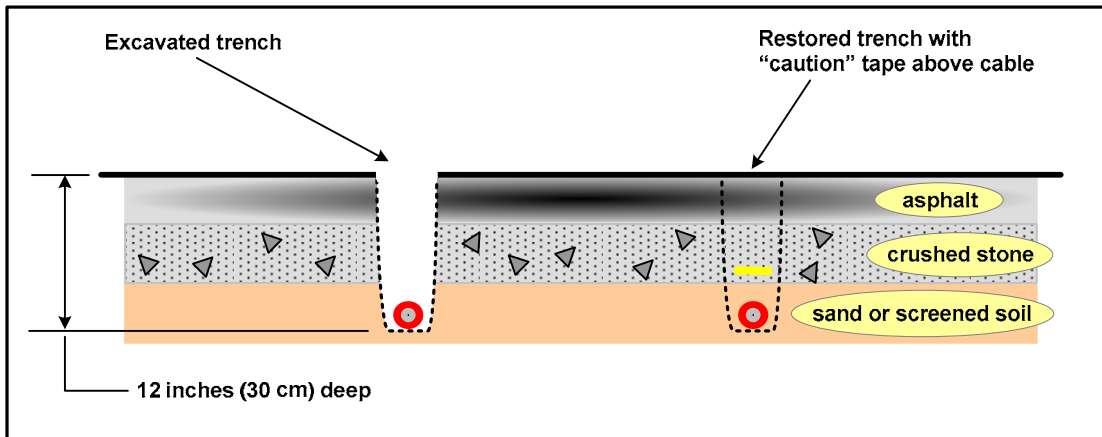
Sensor Cable in Asphalt (or Concrete) less than 4 inches (10 cm) thick
